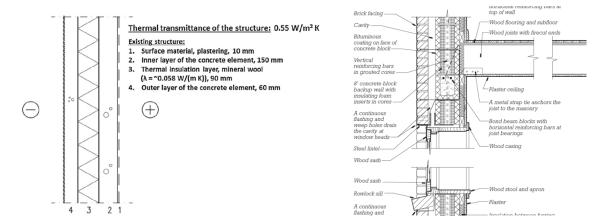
Typical existing concrete building wall section detail in Finland (left) and in the US (right) (Allen & Iano 2019)
